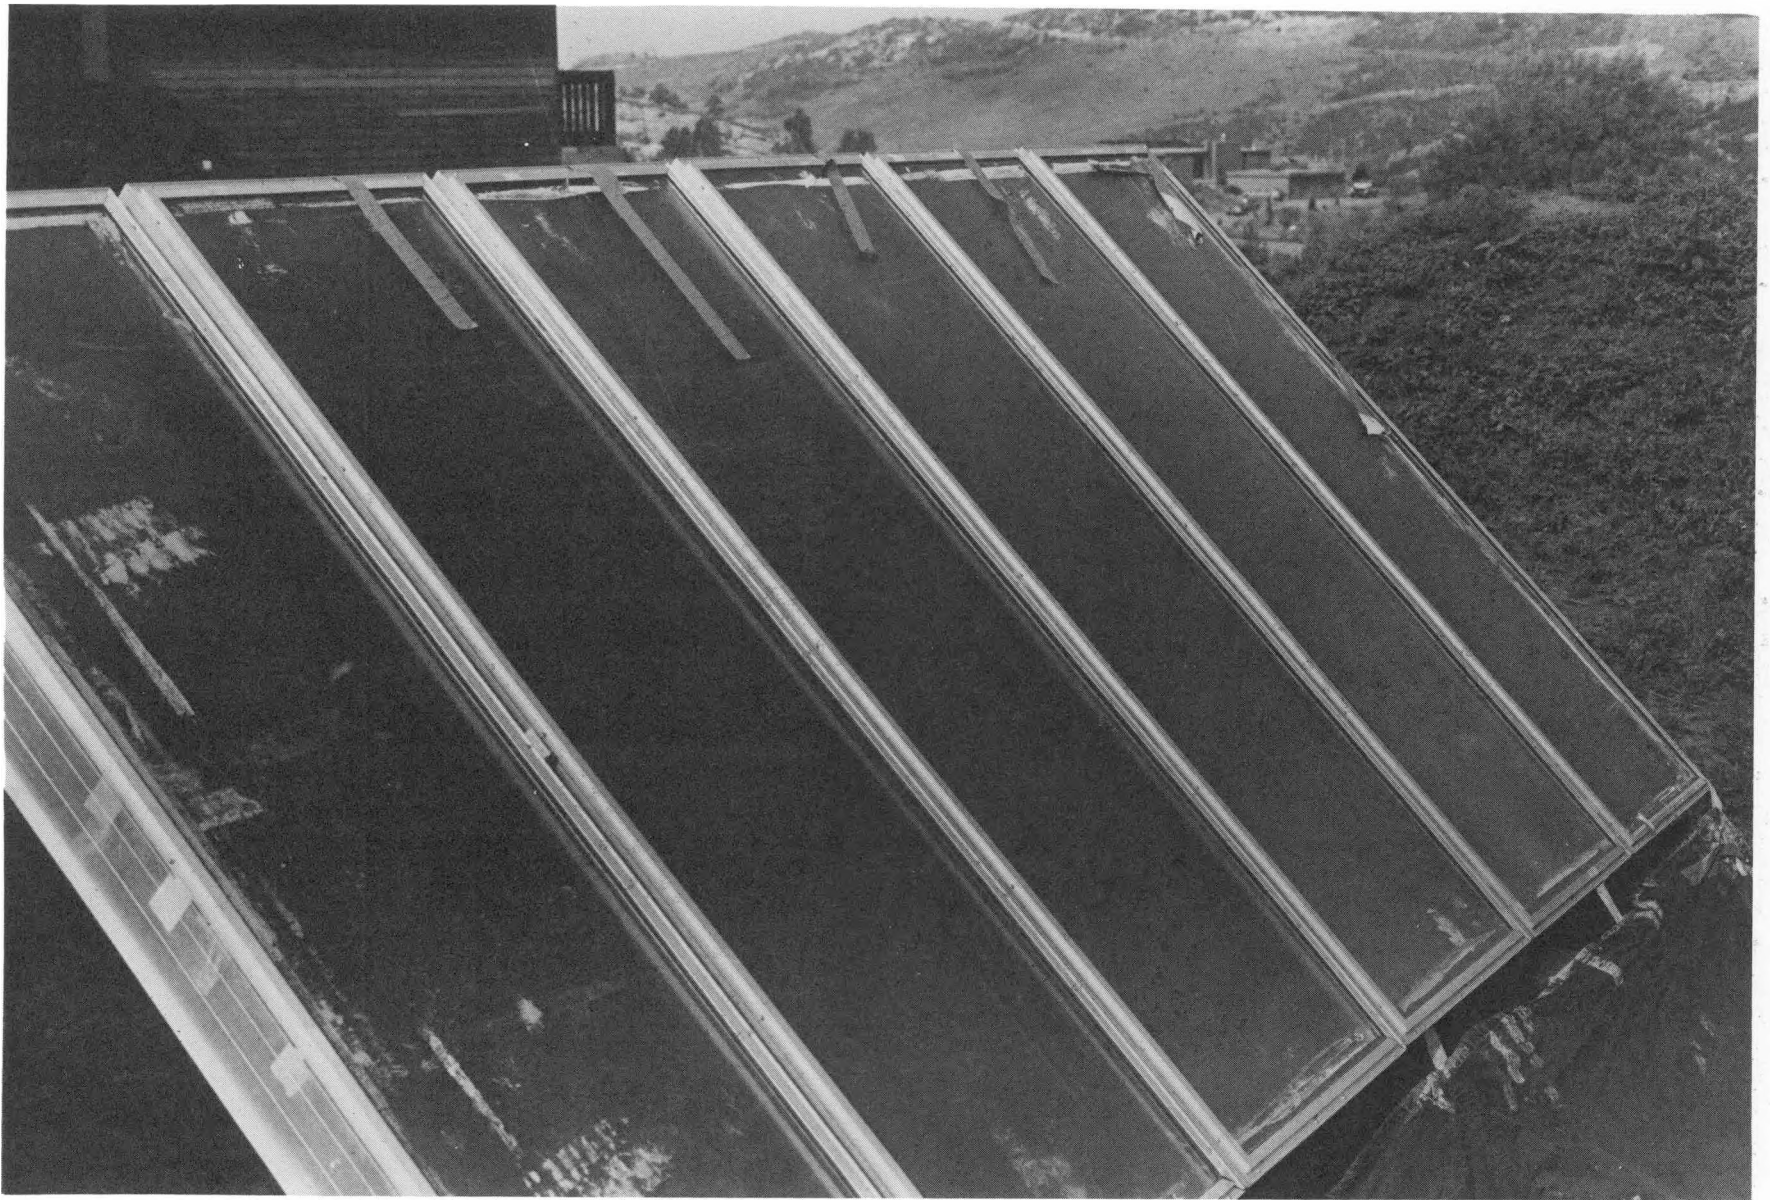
SUPPORT STRUCTURES IN DETAIL OF COLLECTORS AT DENVER HOUSE
